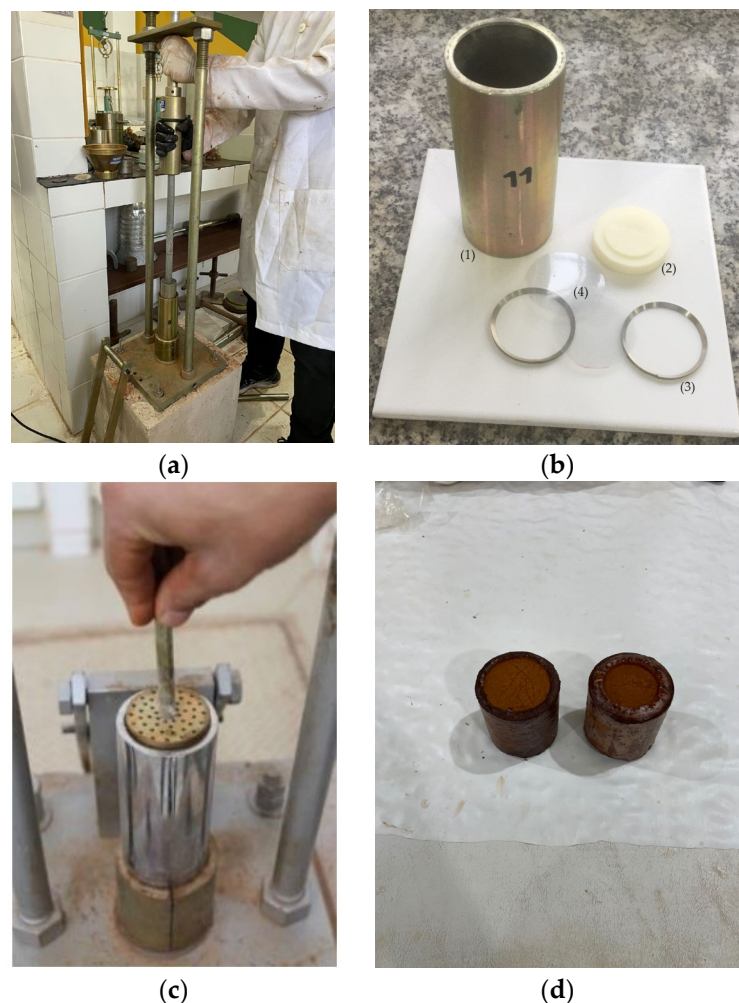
MiniProctor (a); MiniProctor parts (b) cup (1), plastic mold (2), metallic rings (3), and plastic sheets (4); piston used to pre-compact the soil (c); prepared test specimens (d).
